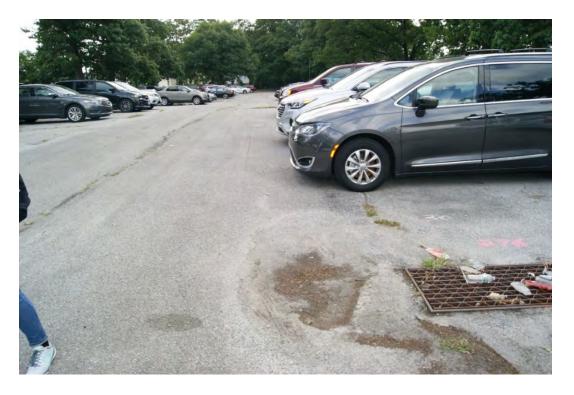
E and 38S show the conditions of storm drains on Site A. All observed storm drains were surrounded by excessive pavement cracking and sediment.
